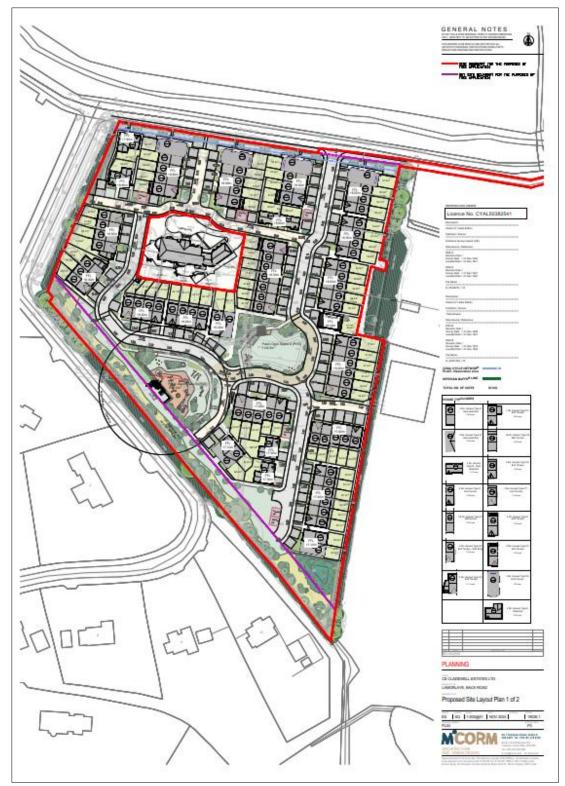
Proposed site layout of the housing development at Lamorlaye, Back Road, Malahide, Co. Dublin.
